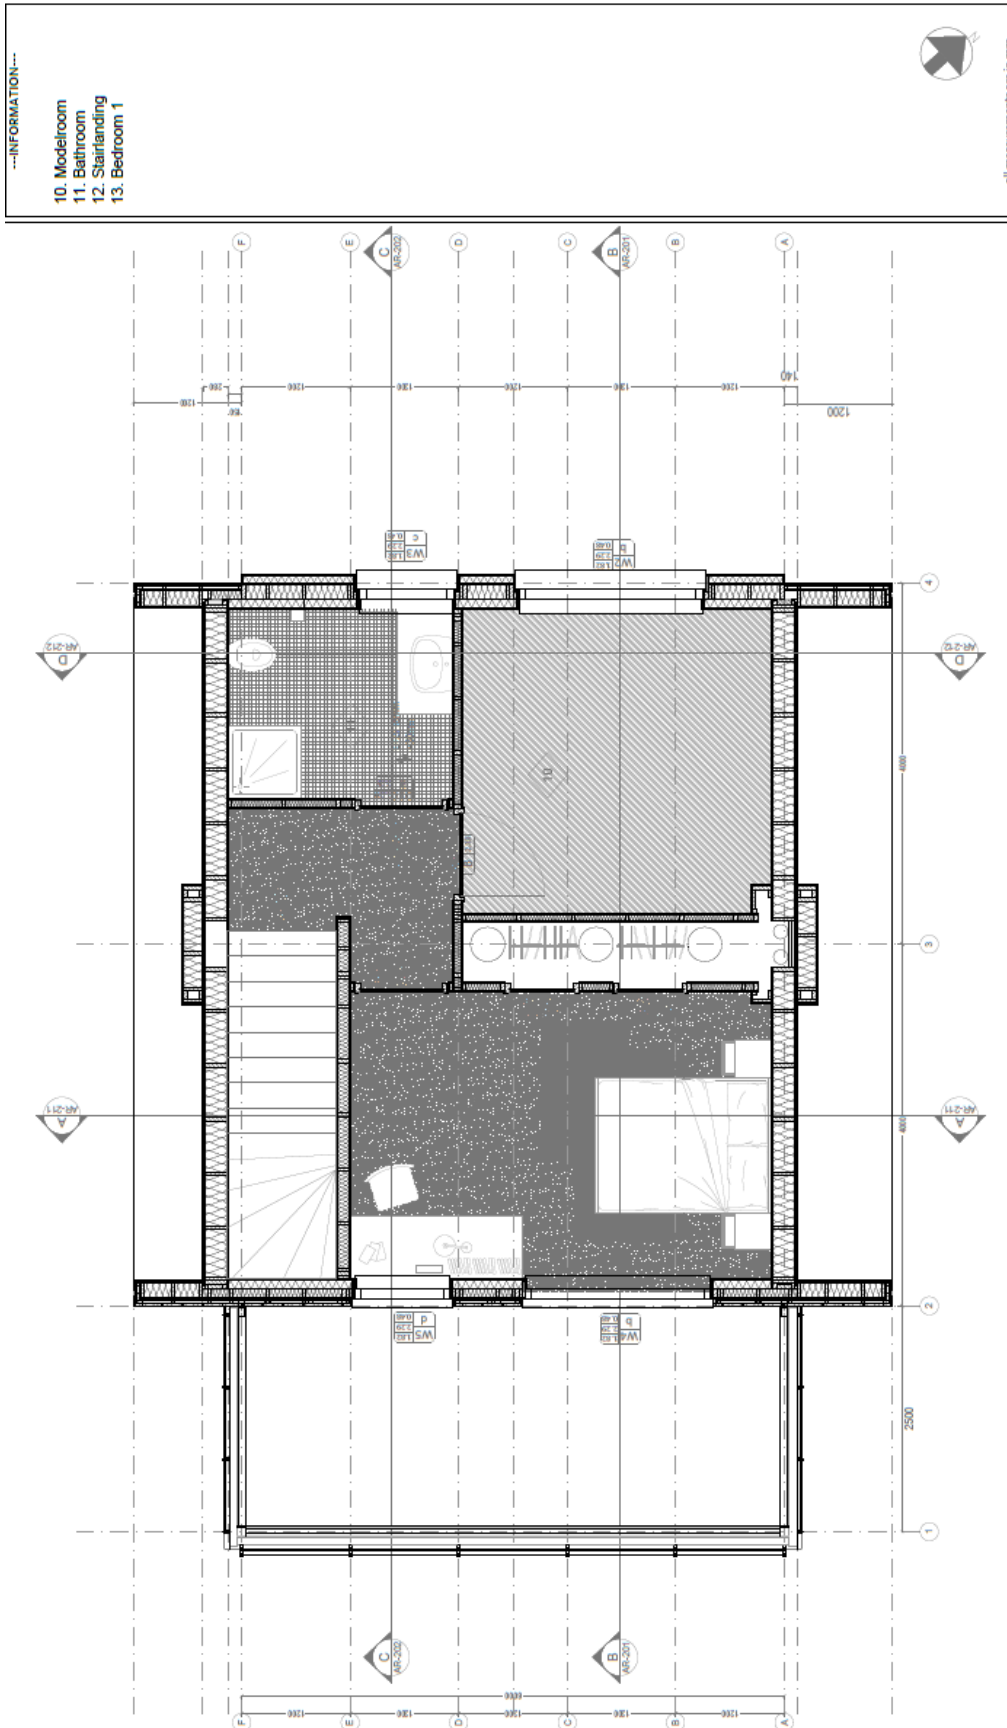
1st floor plan of prototype house (Pret-a-loger, 2014)
